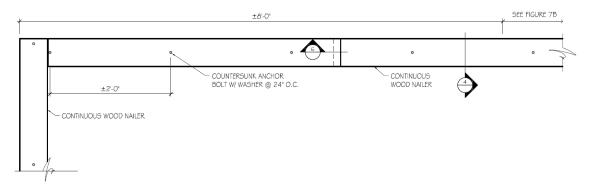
A - ROOF EDGE WOOD BLOCKING @ CORNER - THROUGH BOLT ANCHORAGE 8'-0" FROM CORNER
